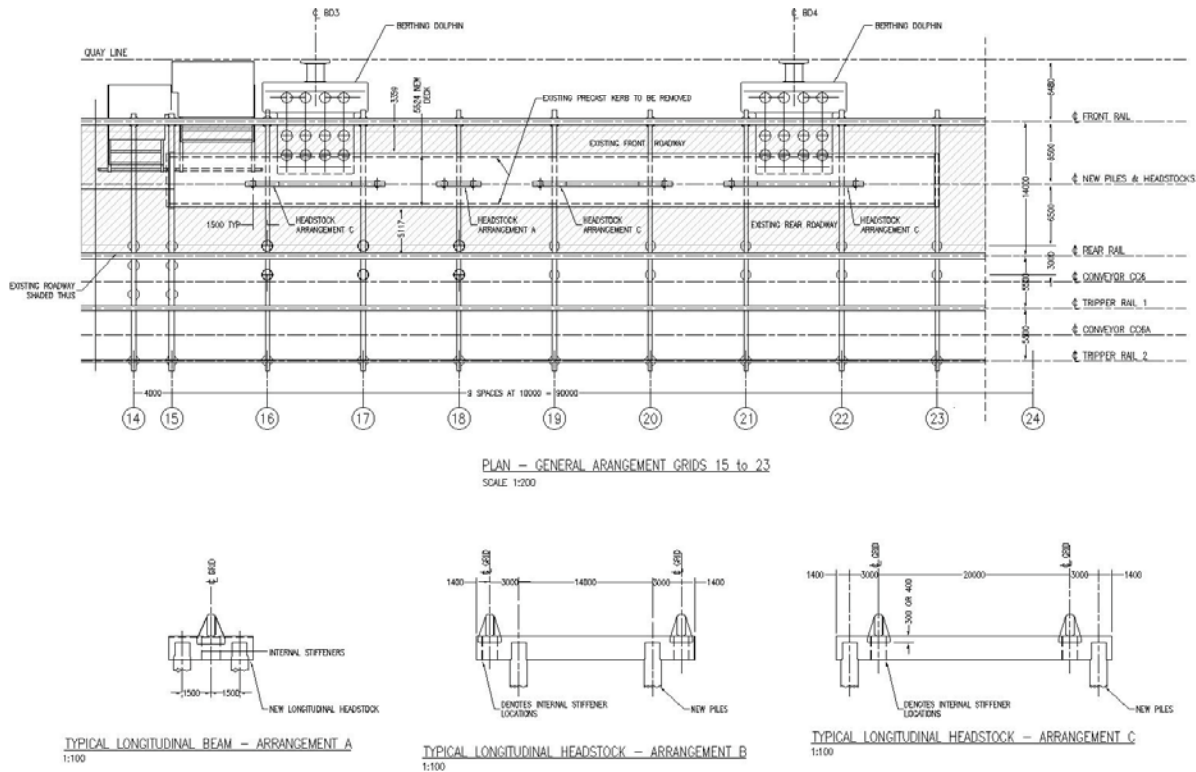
General Arrangement showing Berth 1 Infill Support Layout
